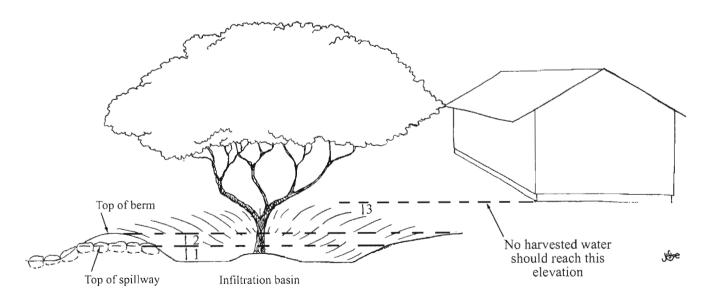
Three important elevations: Elevation 1: Earthwork bottom or basin is lower than elevation of spillway to ensure water is harvested, rather than drained. Elevation 2: Overflow spillway is the low point of earthwork's perimeter. Elevation 3: Perimeter or edge of earthwork is below anything you don't want water to back up against or flood.
